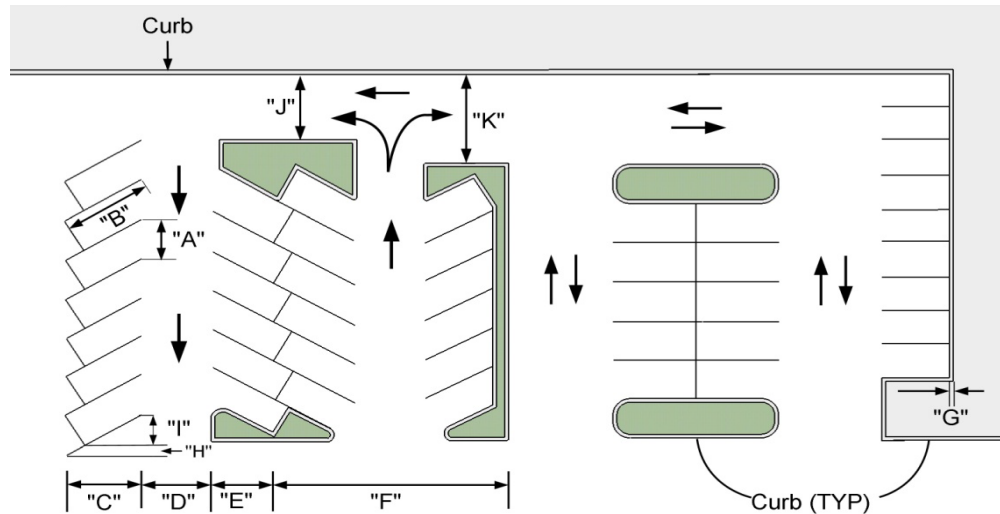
Parking Lot Layout Dimensions; 17.8.8.1:G
